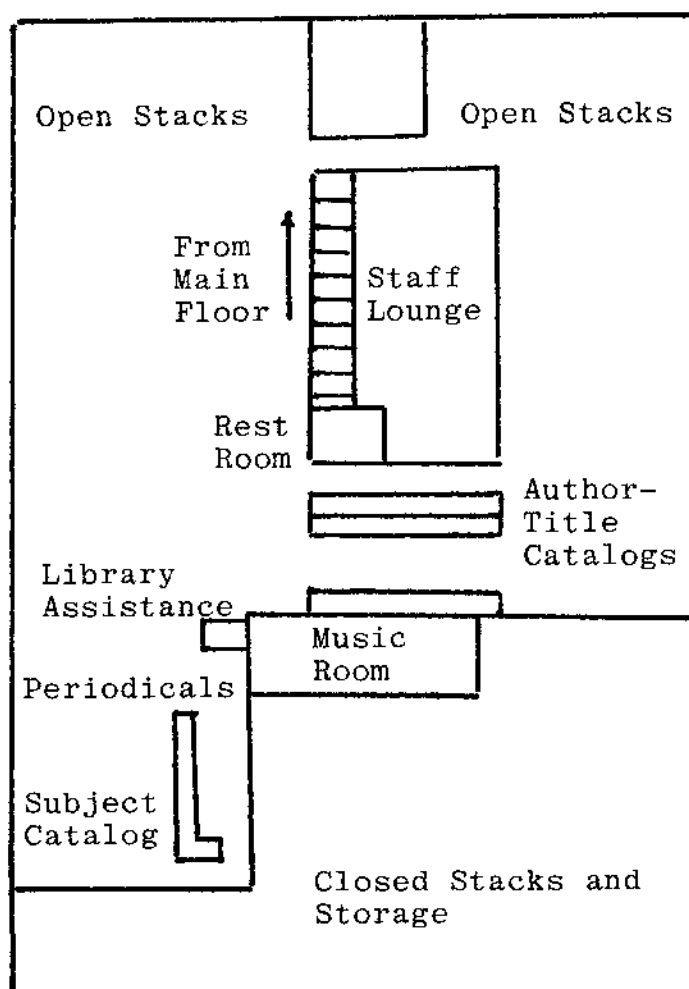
Floor Plan of Old GTU Library (Lower Level)
